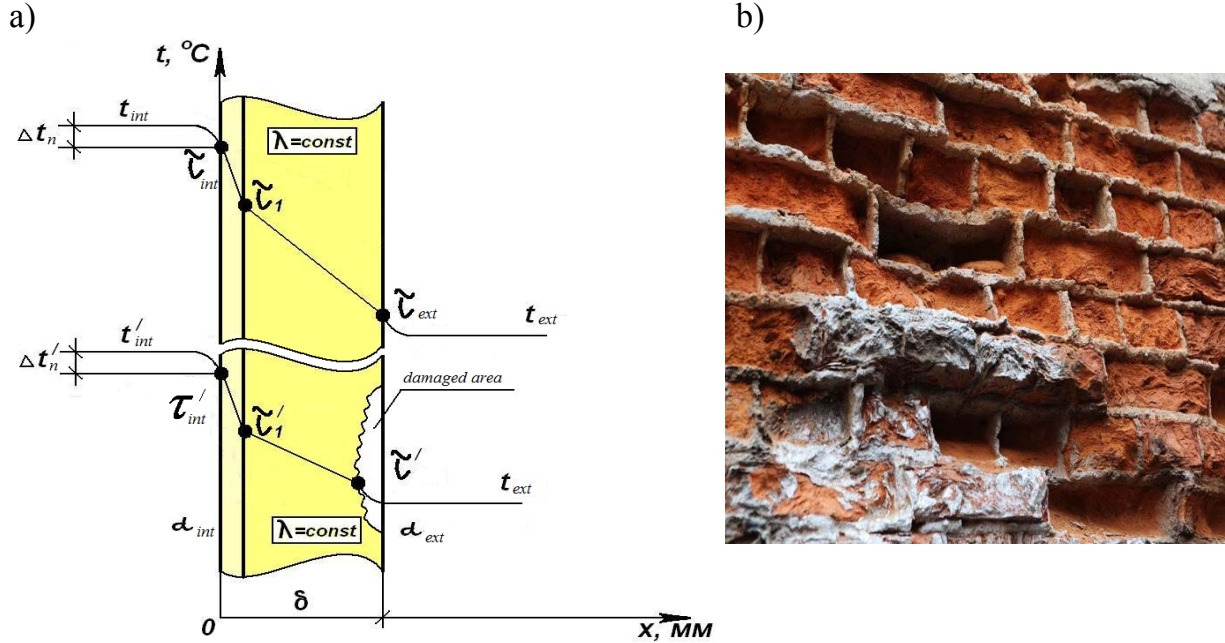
a) Heat transfer through the plane multi-layer wall containing damaged area; b) The possible severe erosion
